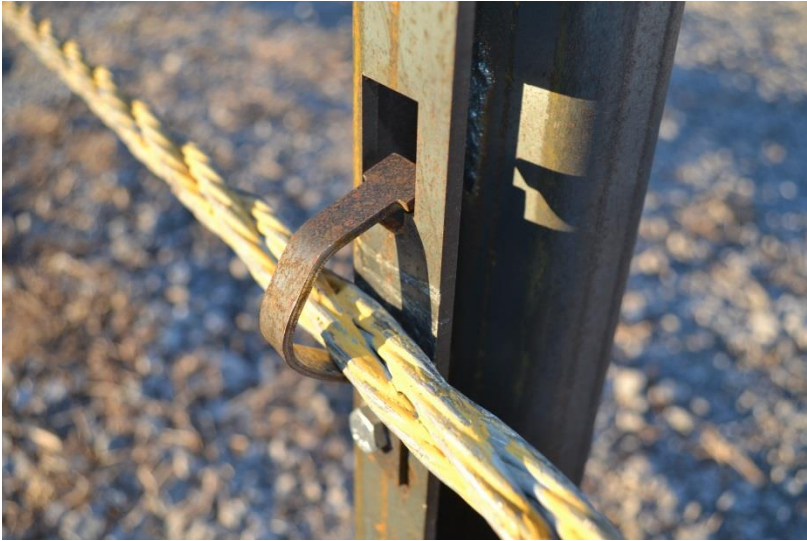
System Damage, Cable Brackets, Test No. MWP-6
